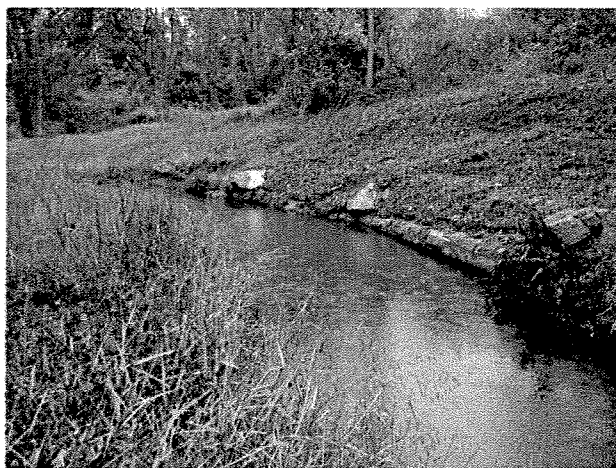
Looking downstream at rock cross vane installed at MS Station 44+38 and root wads/log toe protection. (4/7/04)
